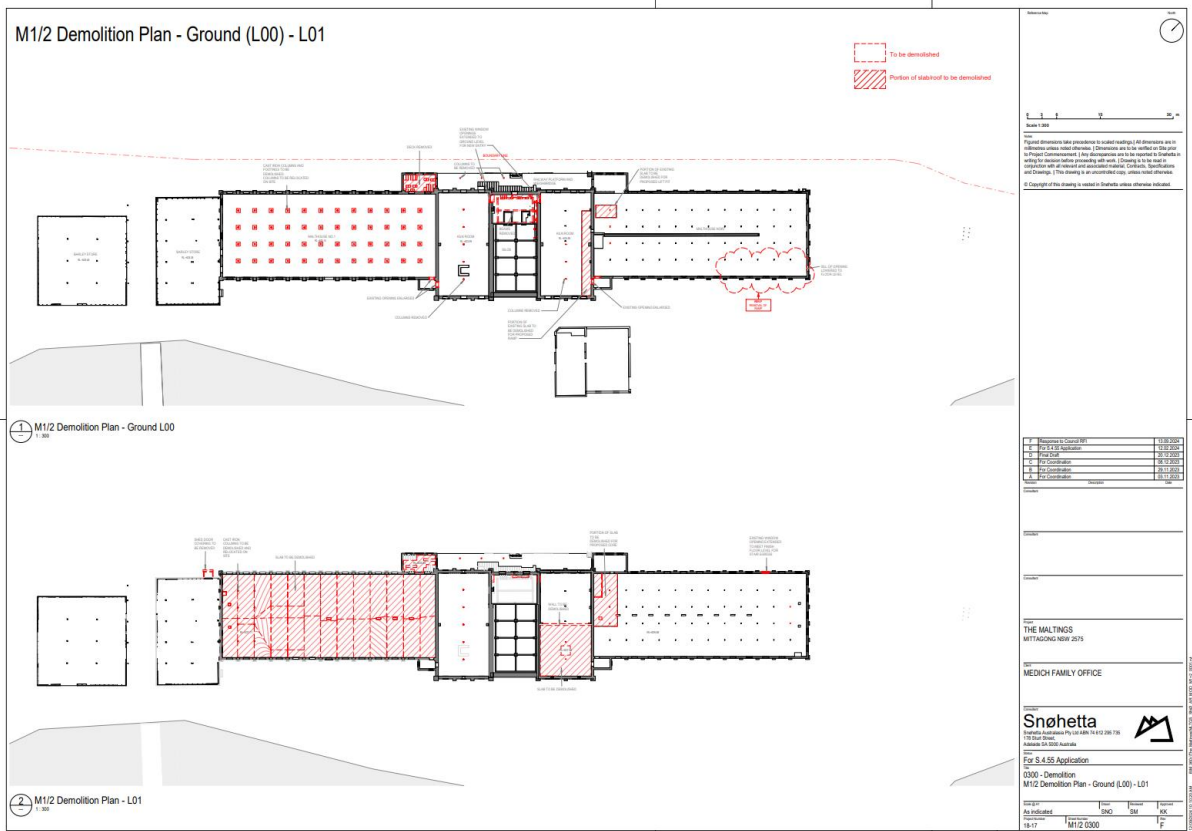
M1/2 Demolition Floor Plan (Ground (L00) – L01)
